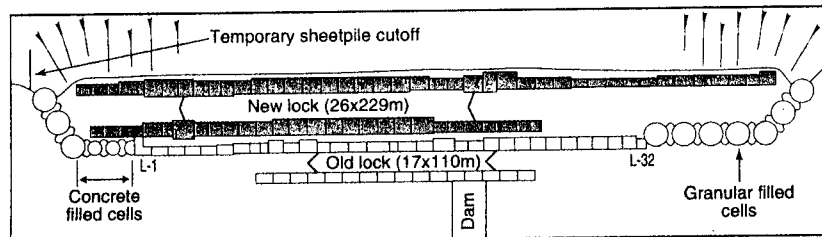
Plan of cofferdam incorporating the existing land wall of the older lock as the river arm of the new cofferdam.
